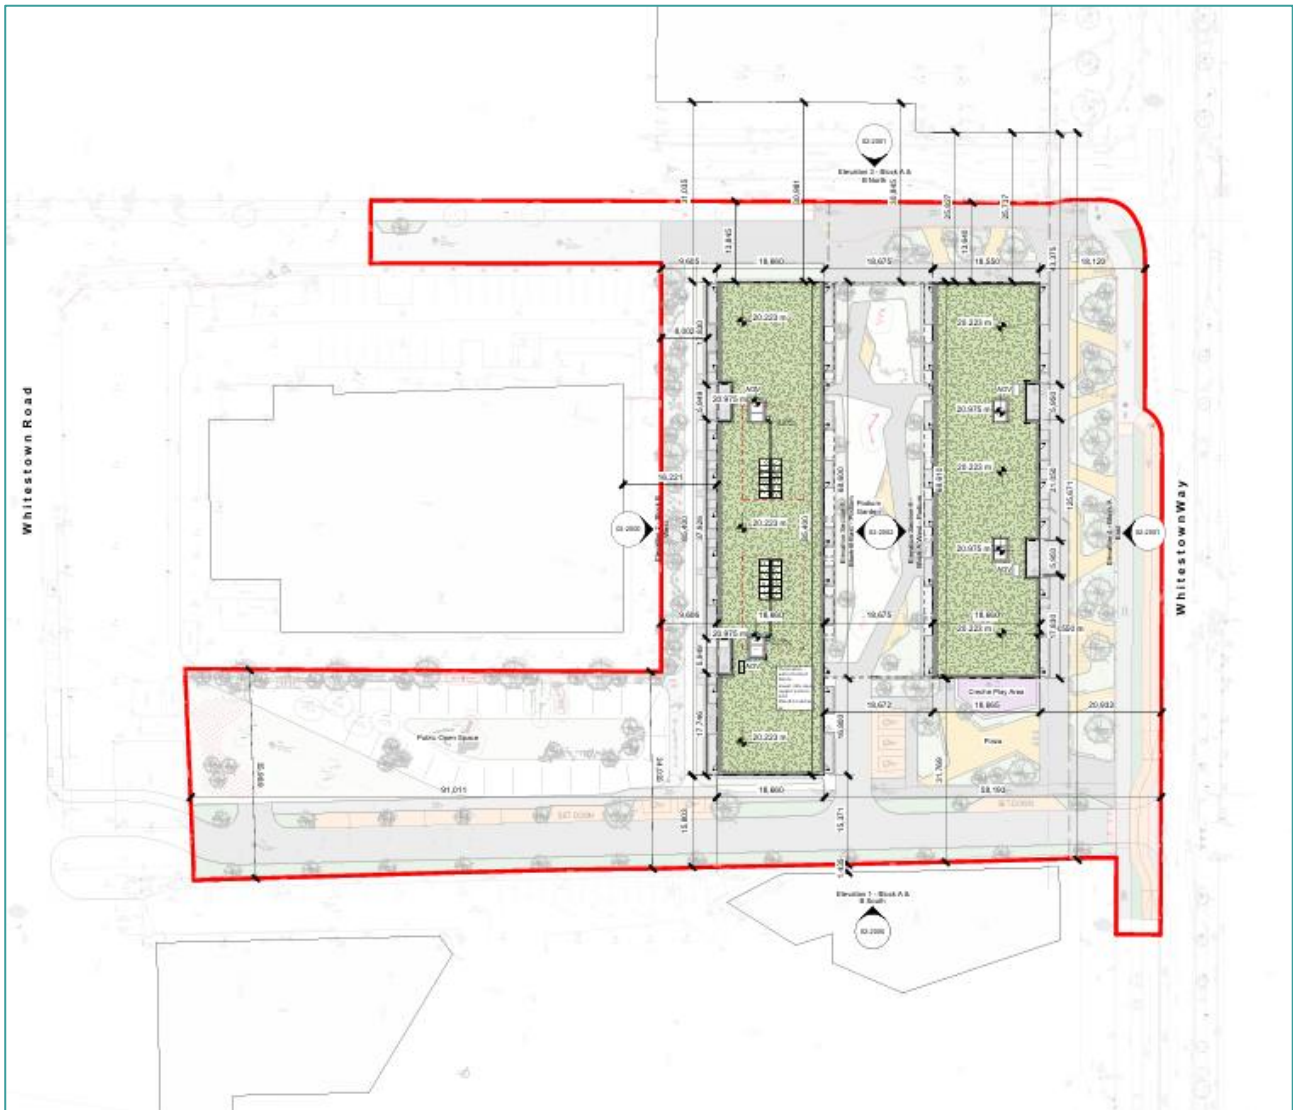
Proposed Site Layout — Whitestown Way, Dublin 24 (Schematic, Not to Scale)
